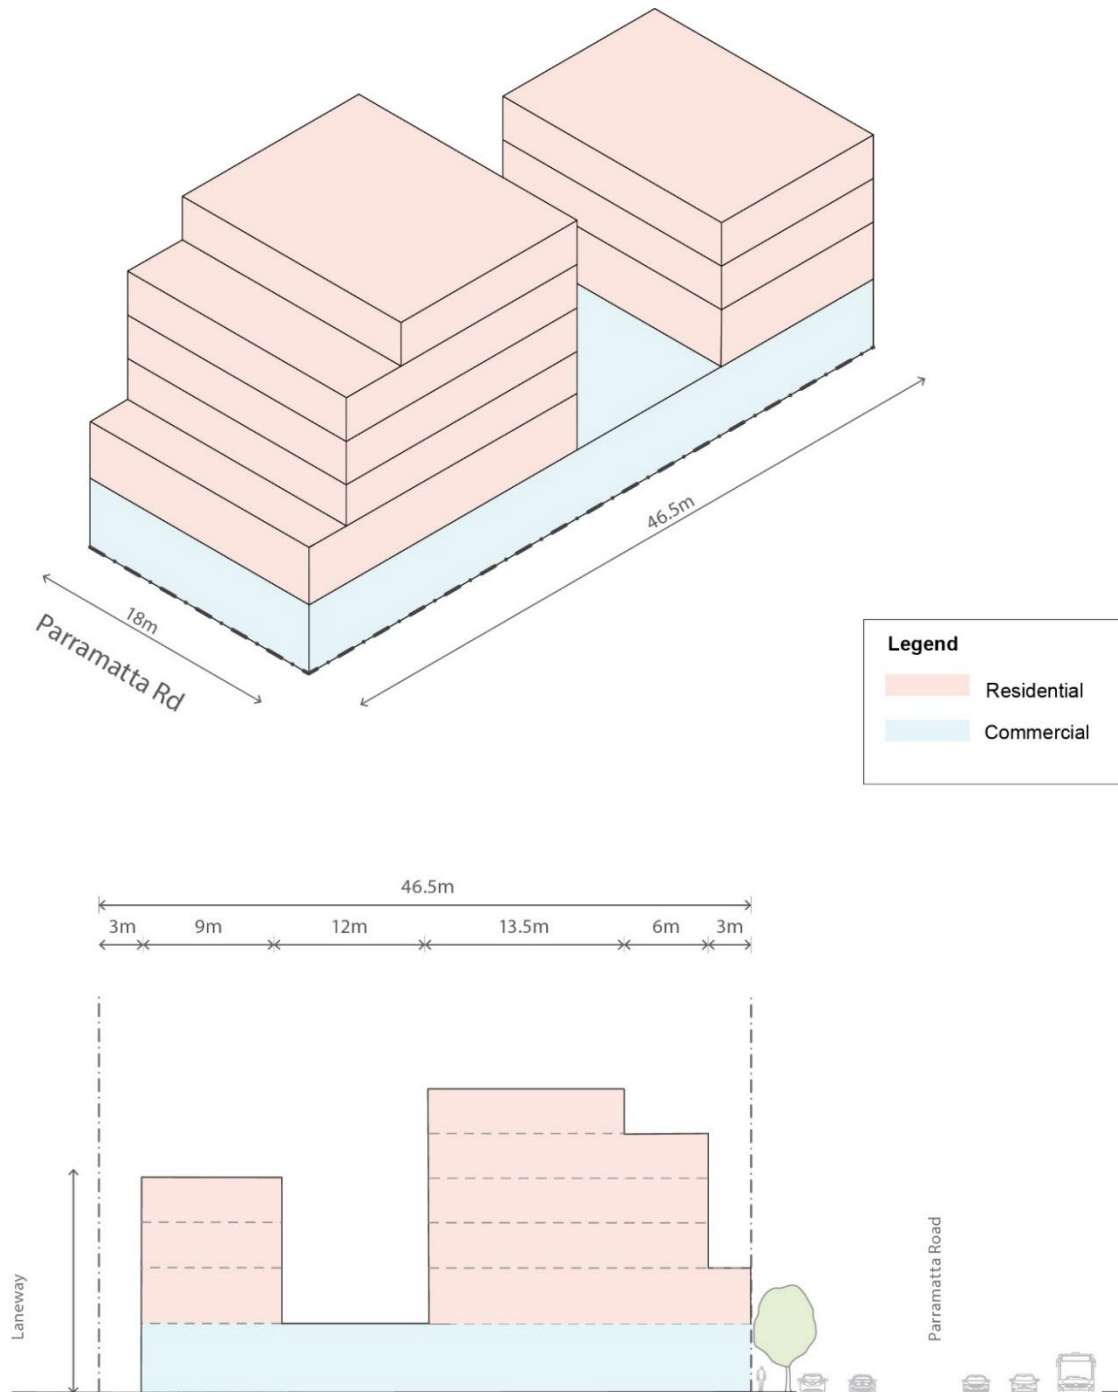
Indicative Area 1 - Parramatta Road deeper lot (46.5m) - built form bulk, scale and site layout – axonometric and section
